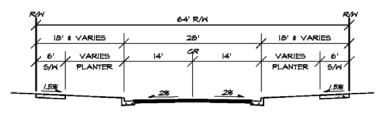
Typical Street Cross Sections M-Blub-outs
